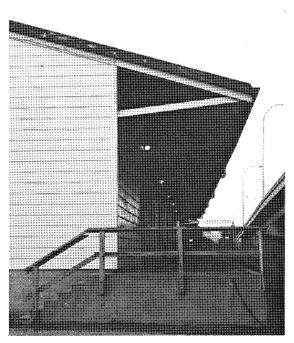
Wood handrailings on steps accessing the northside dock of Building 822 are collapsing. Concrete is also showing signs of deterioration.
